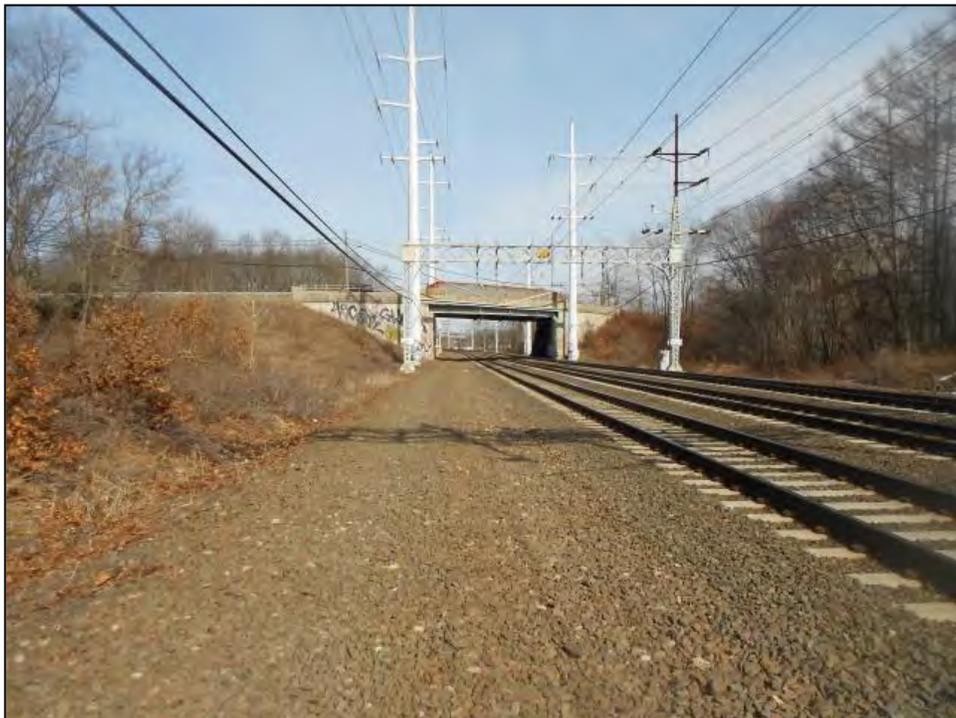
Overview photo of the locations of access to Towers MD05 and MD13 facing east.
